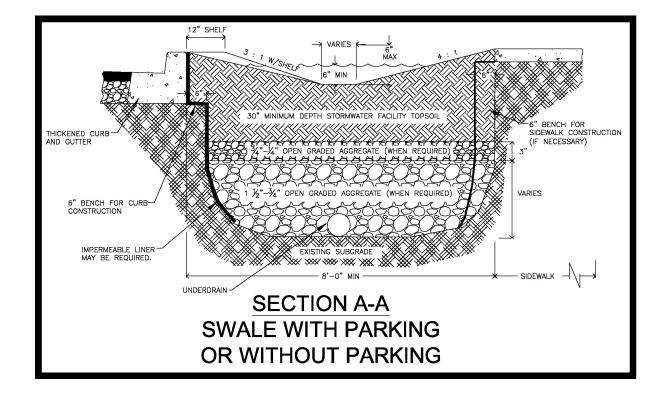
Green Streets Swale Section View (source: Portland, 2011)
